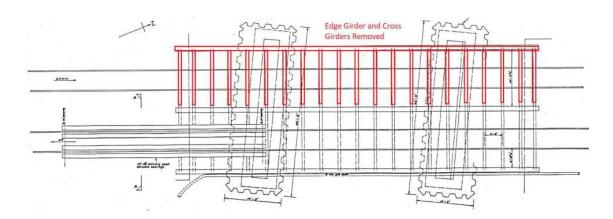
Chain Bridge - Plan Extracted from Record Drawing
